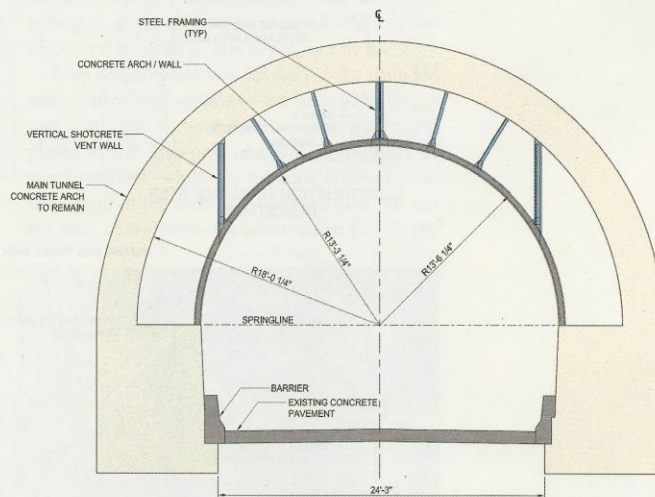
Existing tunnel ventilation arch wall section—cross section
